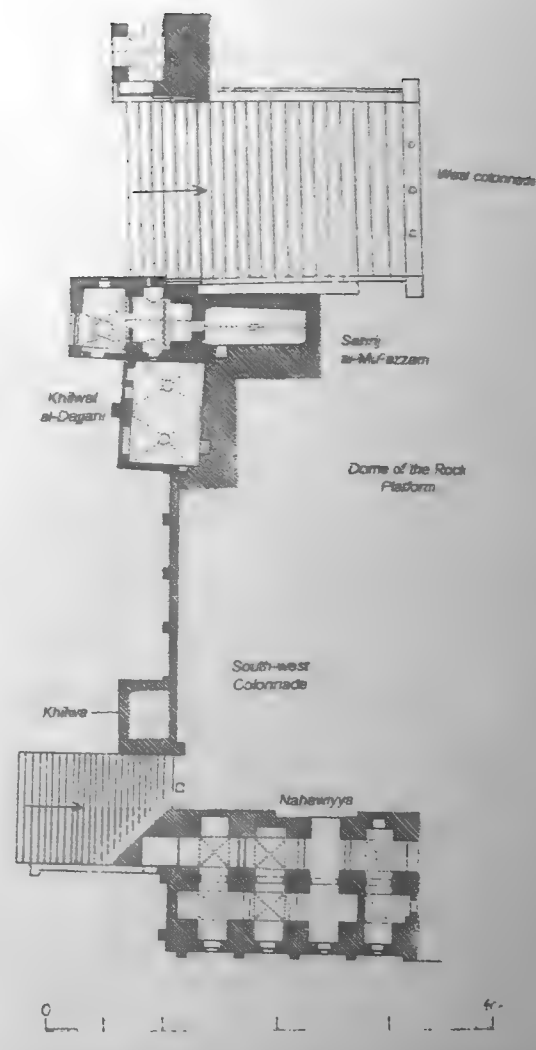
Madrasa al-Nahawiyya, sketch plan of the ground floor of the southwestern corner of the Dome of the Rock terrace.
